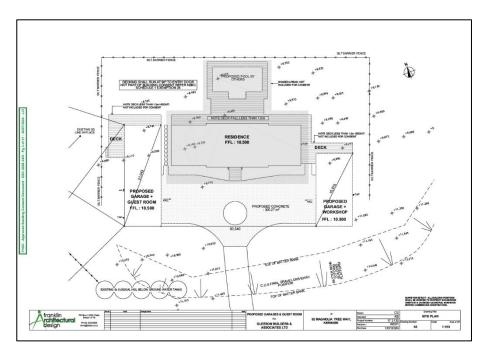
Site Plan [Source: Franklin Architectural Design]
